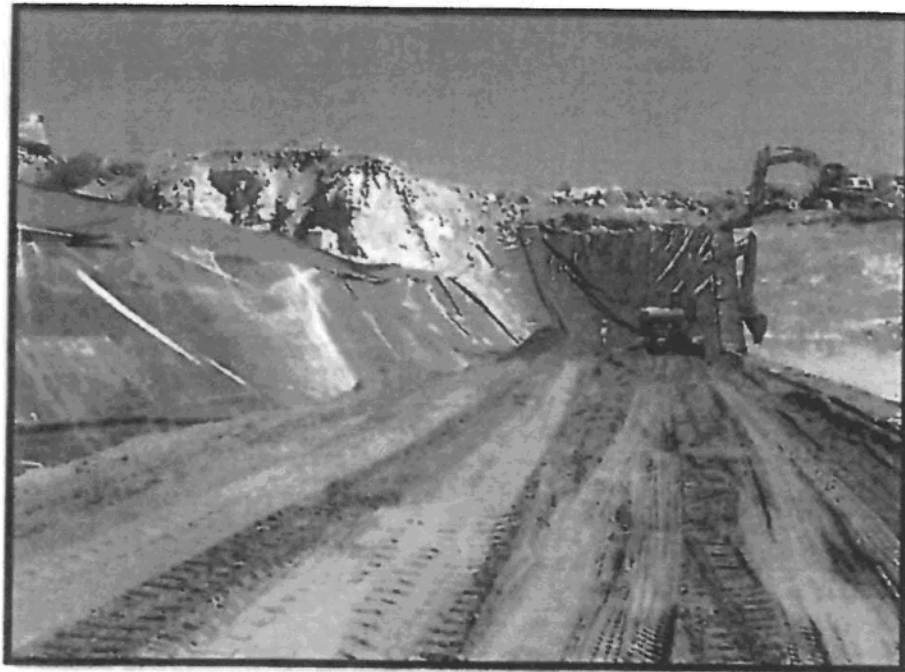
Placement of Leachate Collection Sand Drainage Blanket
